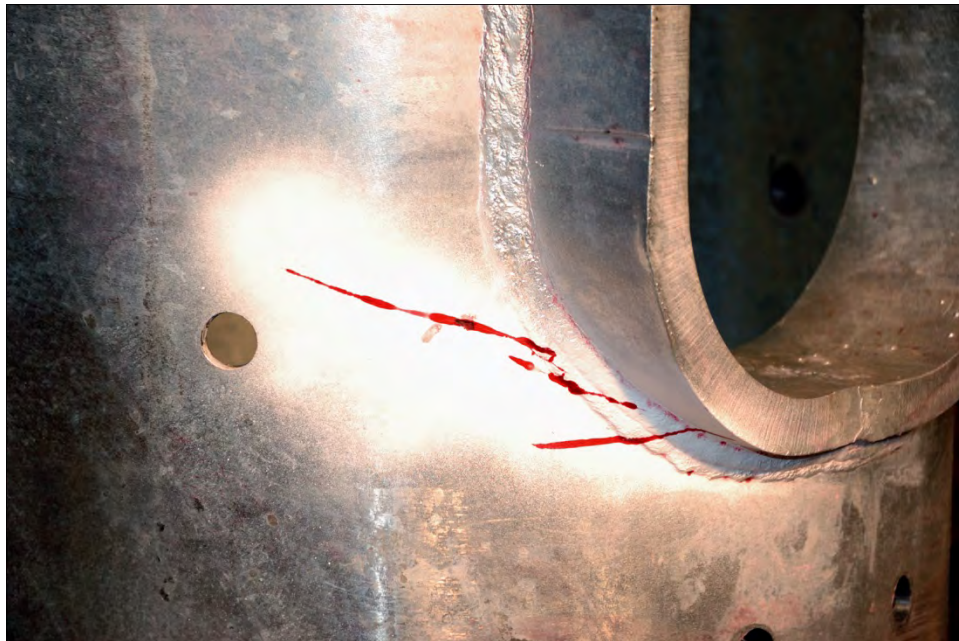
Fatigue crack initiation in specimen JRXI from the root of hand hole frame to pole weld (photographed after jacket removed)
